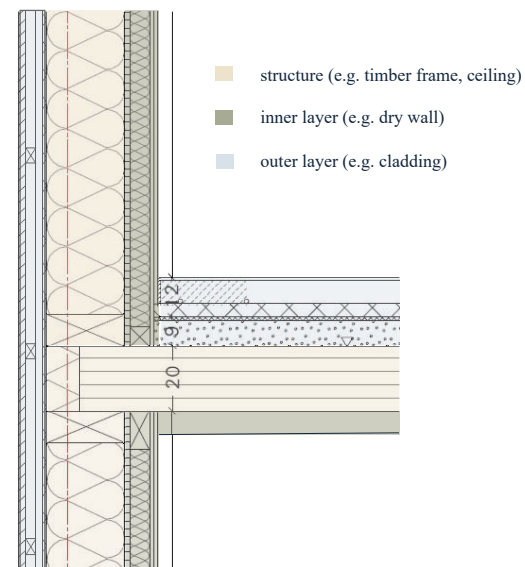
3-layer model for exterior walls and ceilings; Source: Lattke
